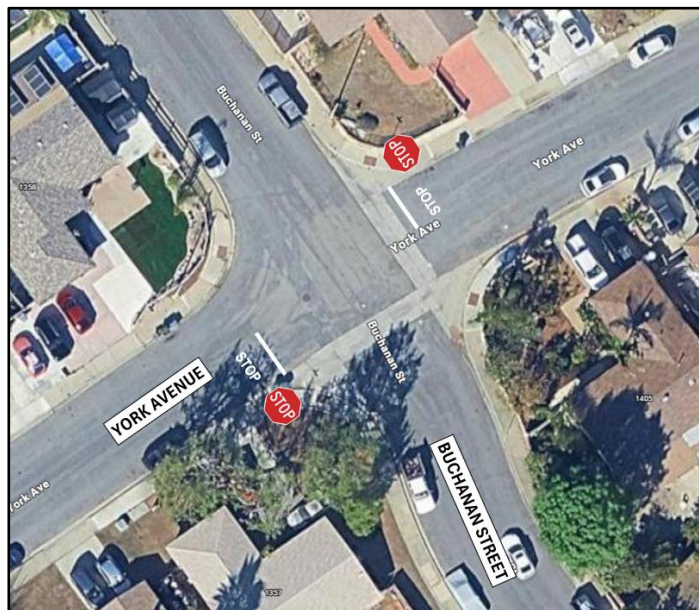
Proposed Minor Street Stop Control – York Avenue at Buchanan Street.
